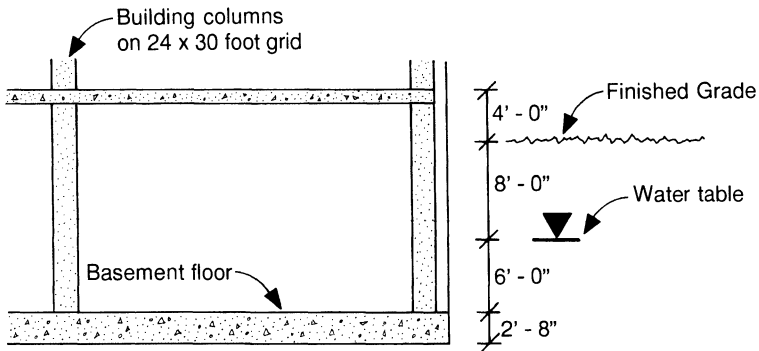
Example F-4—Cross section through building showing general arrangement.
